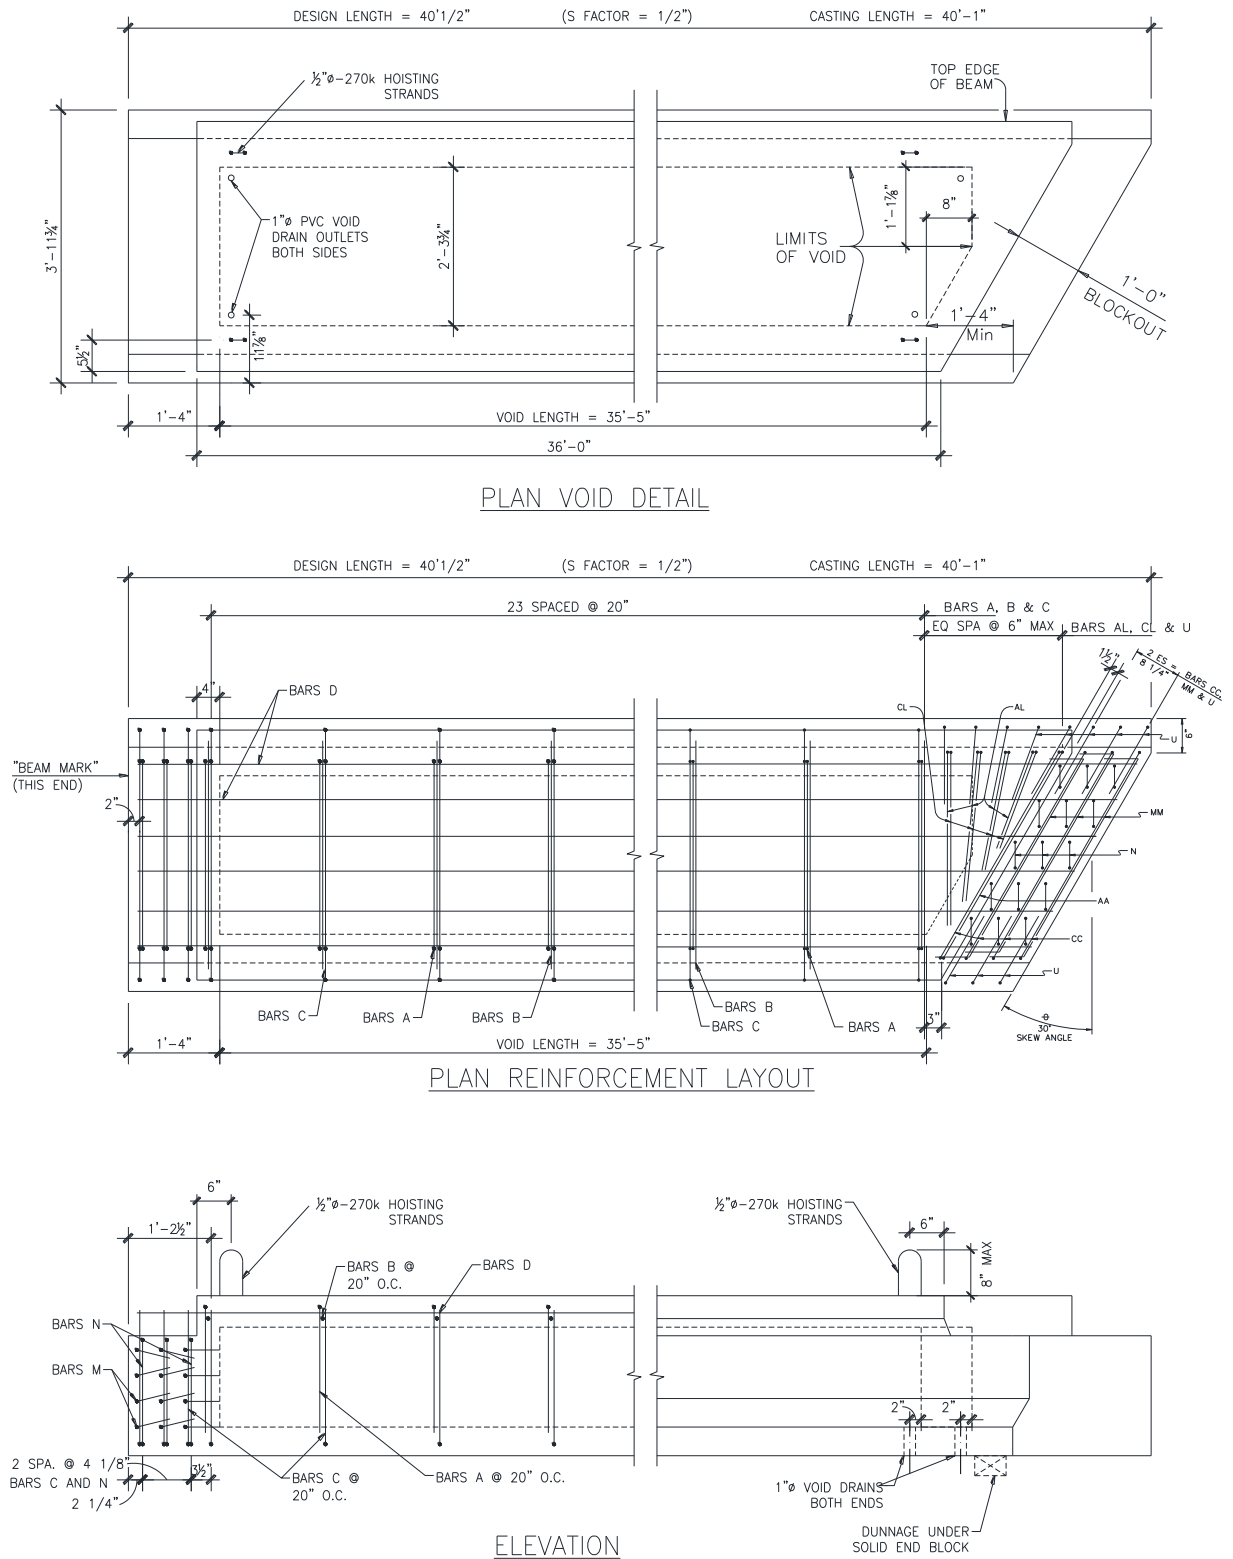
Plan and Elevations for 4B28 box beams: BB-05 and BB-10.
